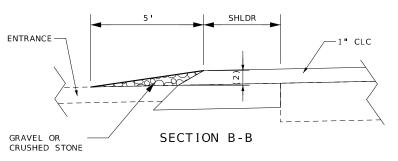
DETAIL - SHOULDER SLOPE AT SIDEROAD INTERSECTION WITHIN MAINLINE SUPERELEVATION
